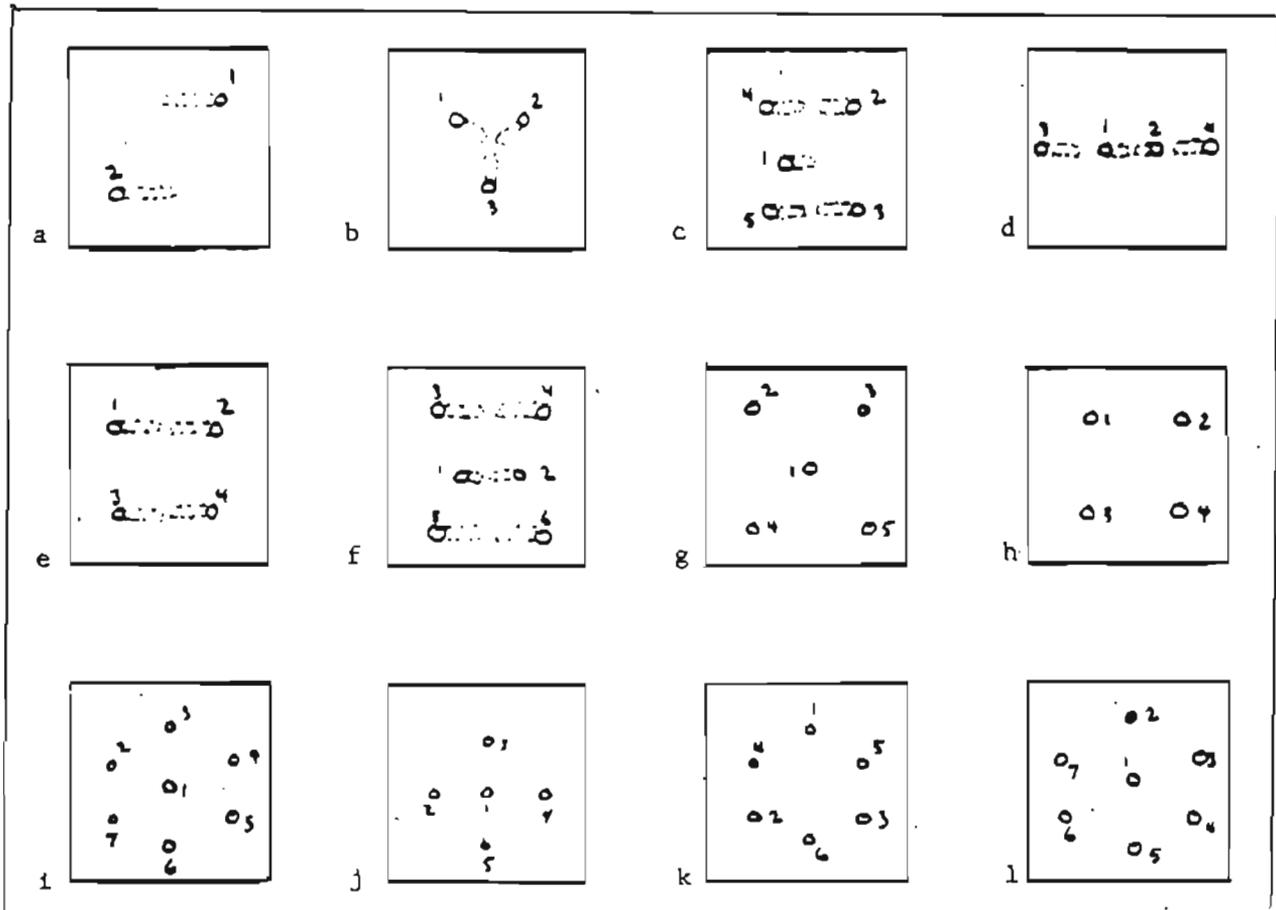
Types of cuts: a - knife; b - pyramid; c - wedge cut with central hole; d - double wedge (baby V); e - four-hole wedge; f - double wedge with six holes; g - prismatic (burn cut) with loaded central hole; h - four-hole prismatic cut; i - six-hole prismatic cut with loaded central hole; j - four-hole prismatic cut with unloaded central hole; k - layered cut; l - spiral cut (with increasing depth).
